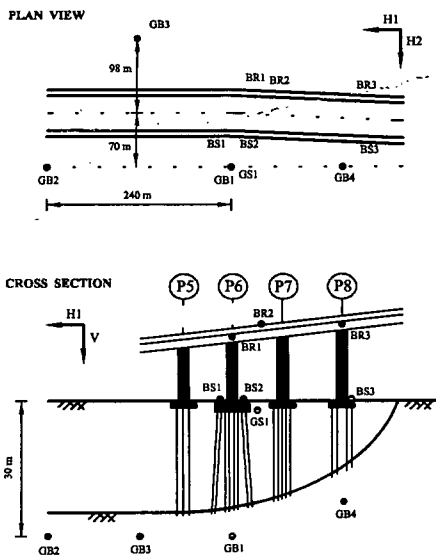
Plan view and cross section of the bridge between pier P5 and P8 (sketch only).
